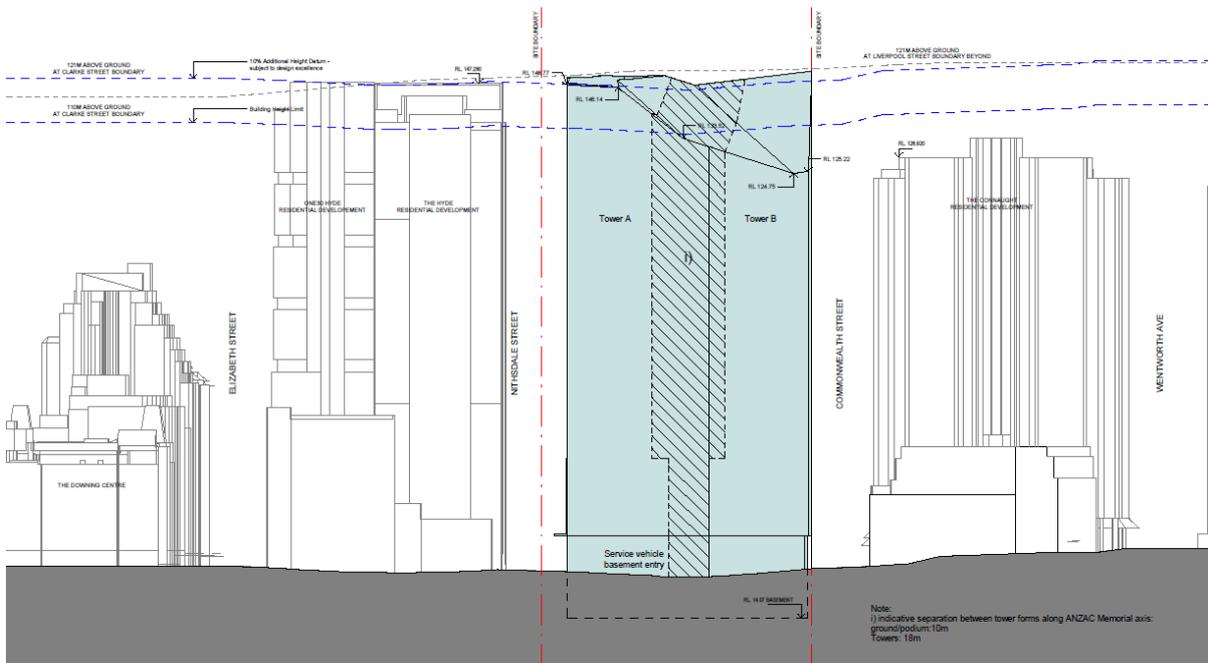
Envelope elevation to Clarke Street, showing sun access plane compliance
